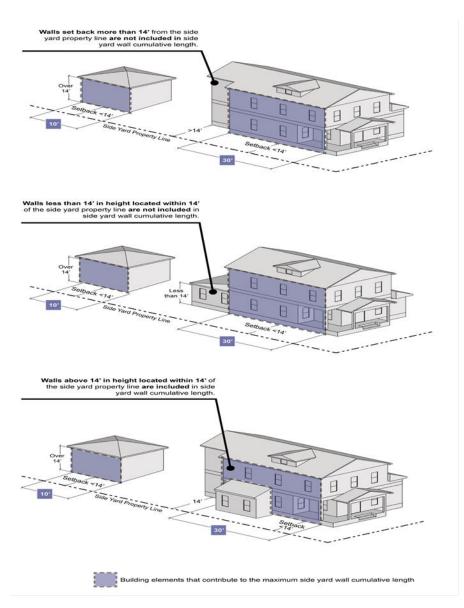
<u>5</u>4: Side Yard Wall Length Articulation Examples ...
